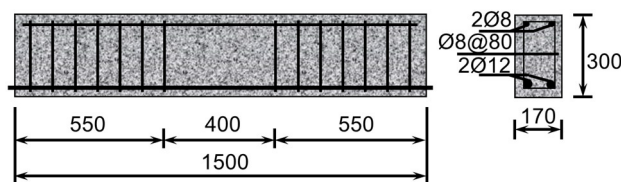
Schematic diagram of reinforced concrete beams.
